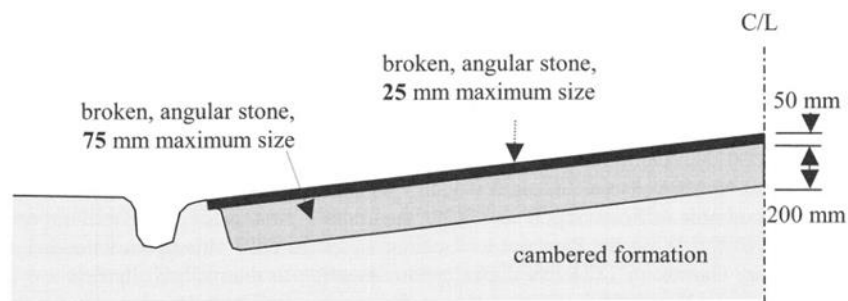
Typical Trésaguet Pavement (Lay 2009)
